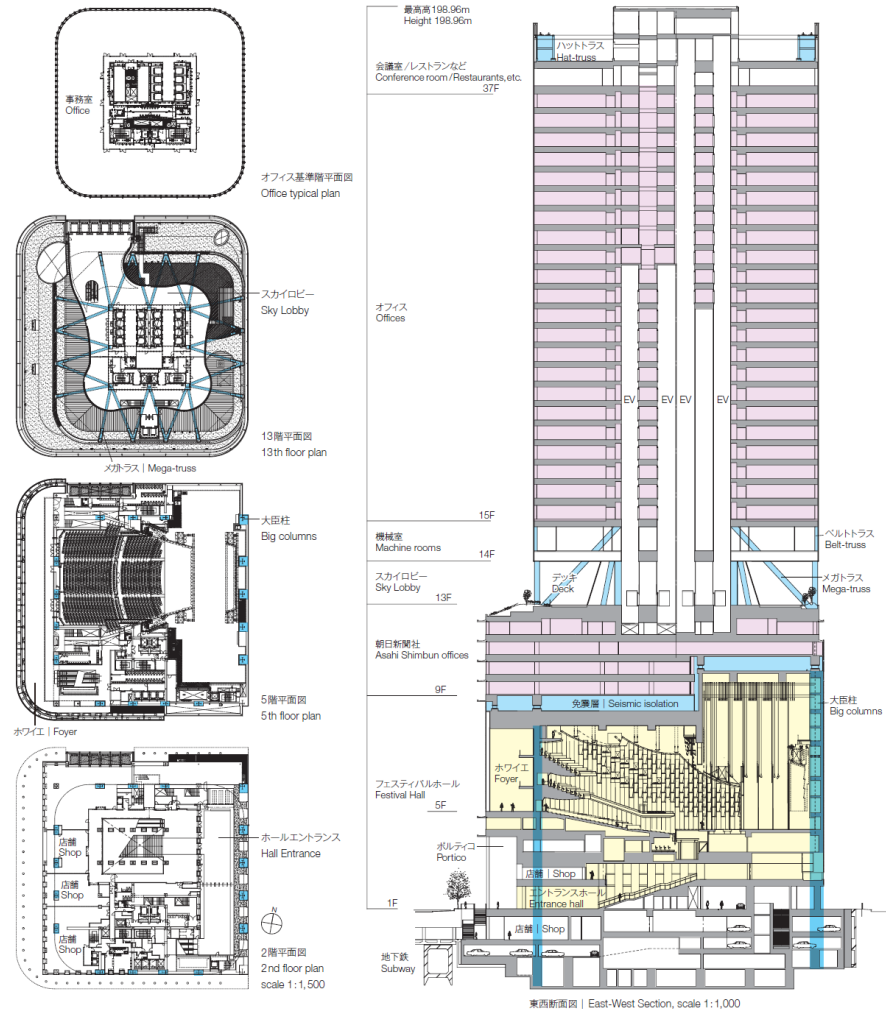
Floor plans: (a) upper typical floor, (b) 13<sup>th</sup> floor, (c) 5<sup>th</sup> floor, (d) 2<sup>nd</sup> floor, (e) cross section of the building
